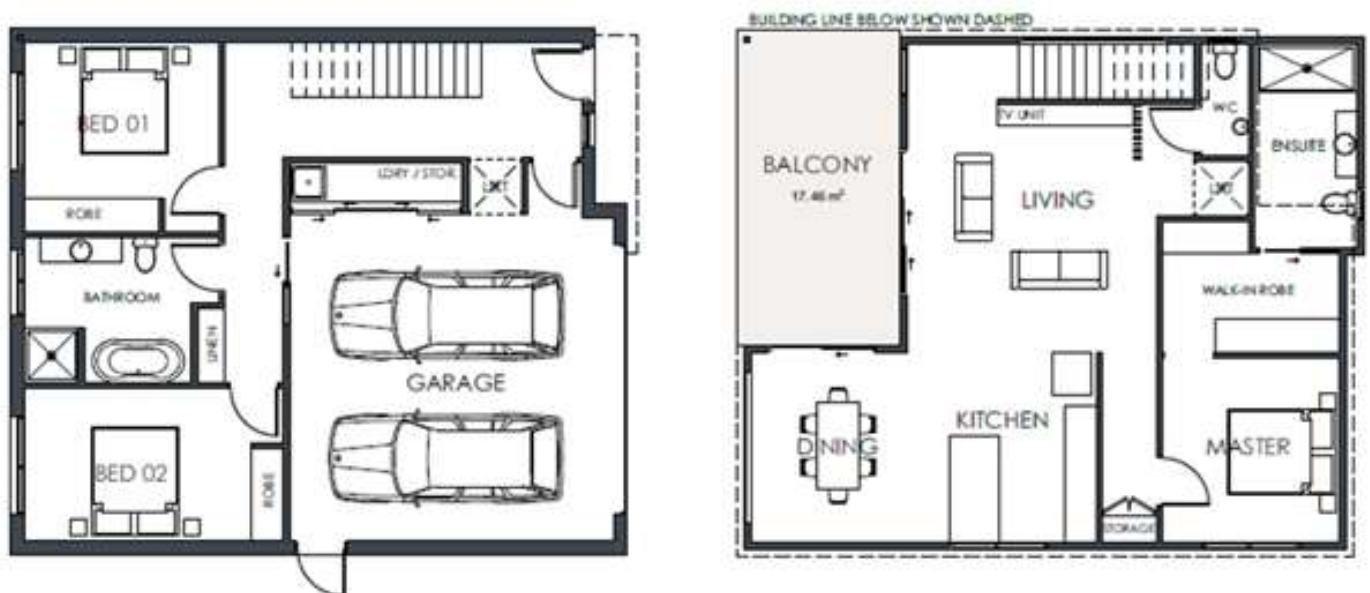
Proposed dwelling- floor plans, lower left, upper right
